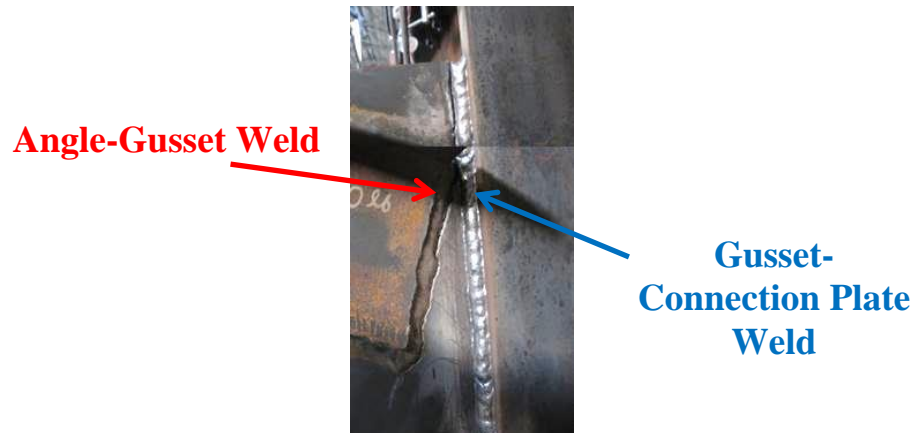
Overlap of Angle-Gusset Weld and Gusset-Connection Plate Weld (XF_1)
